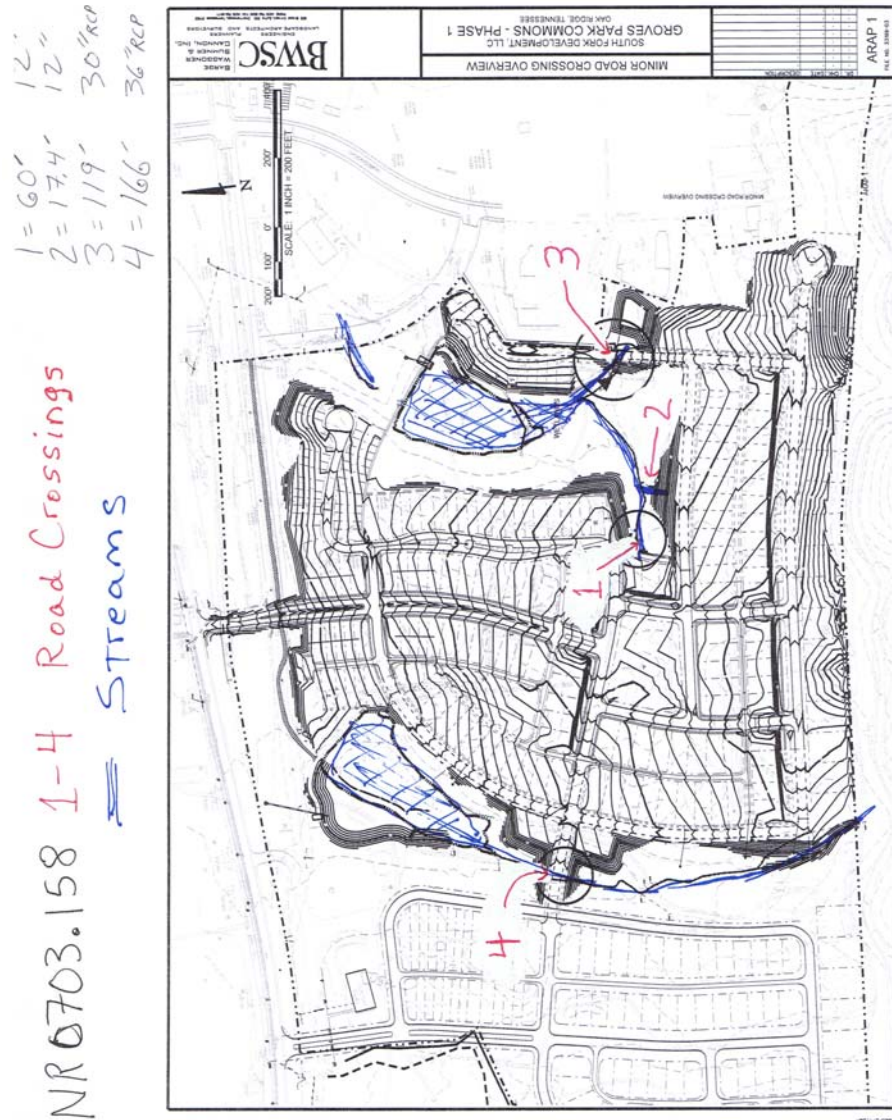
Modified site plan showing the location of the previously authorized road crossings.
